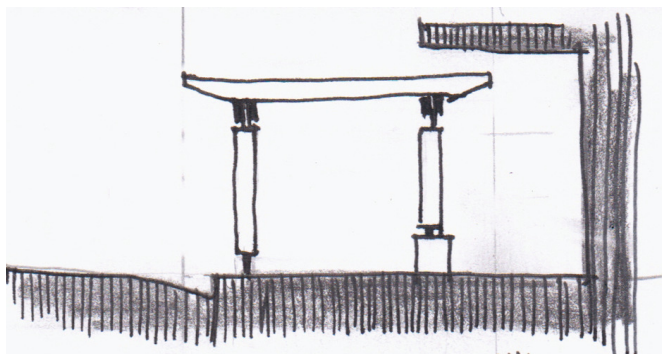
Sectional diagram showing shade structure layered on the horizontal plane.
